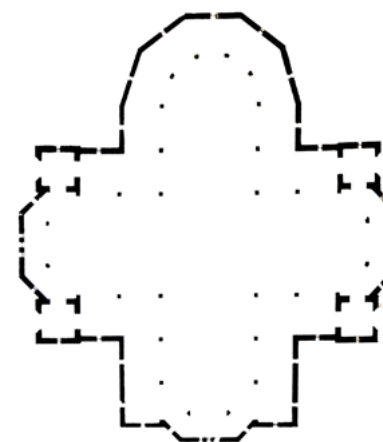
Groundfloor Plan of the original church (Kearney & Harber 1991:13)
